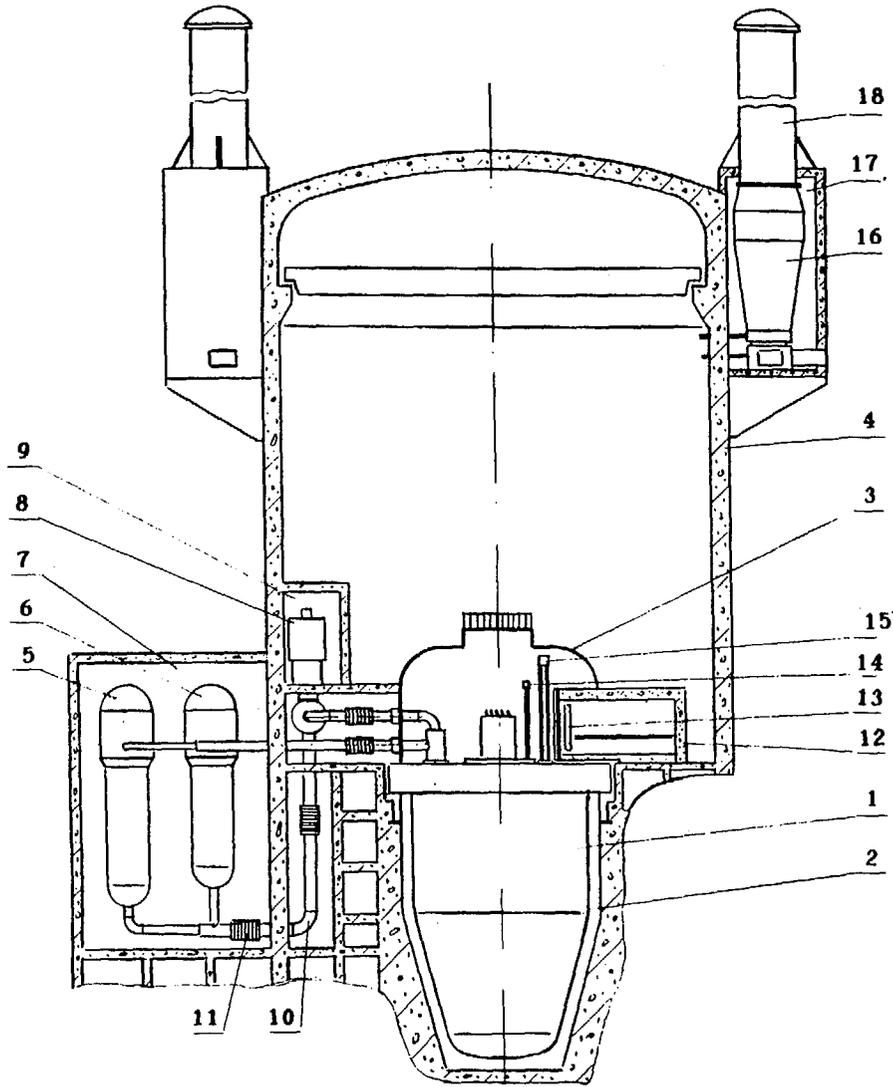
BN-1600 NUCLEAR ISLAND BUILDING LAYOUT
